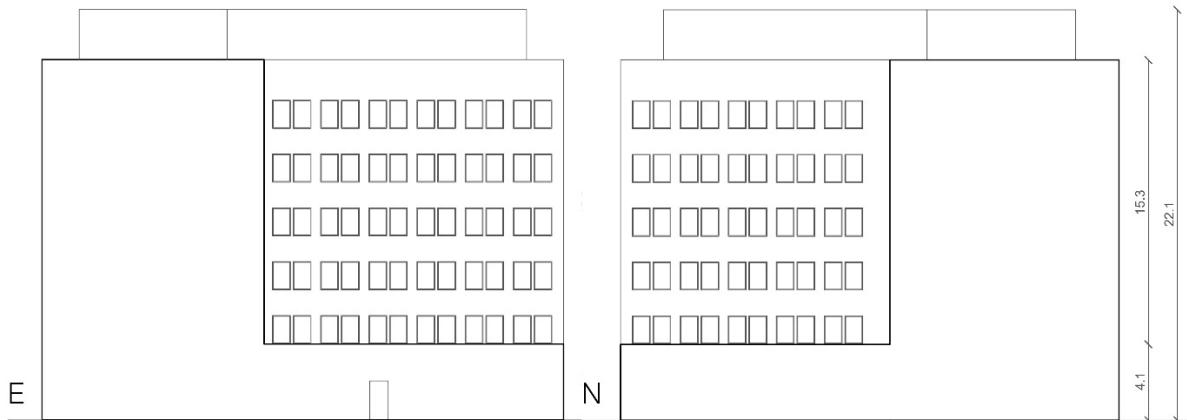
Existing facades with adiabatic walls in view and typical windows' proportion in zoom.
